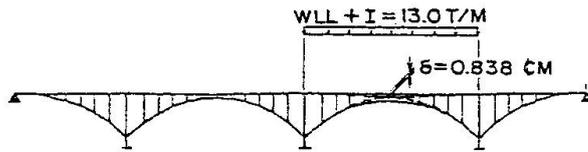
Vertical deflection due to vertical loading (dead load and live load).
